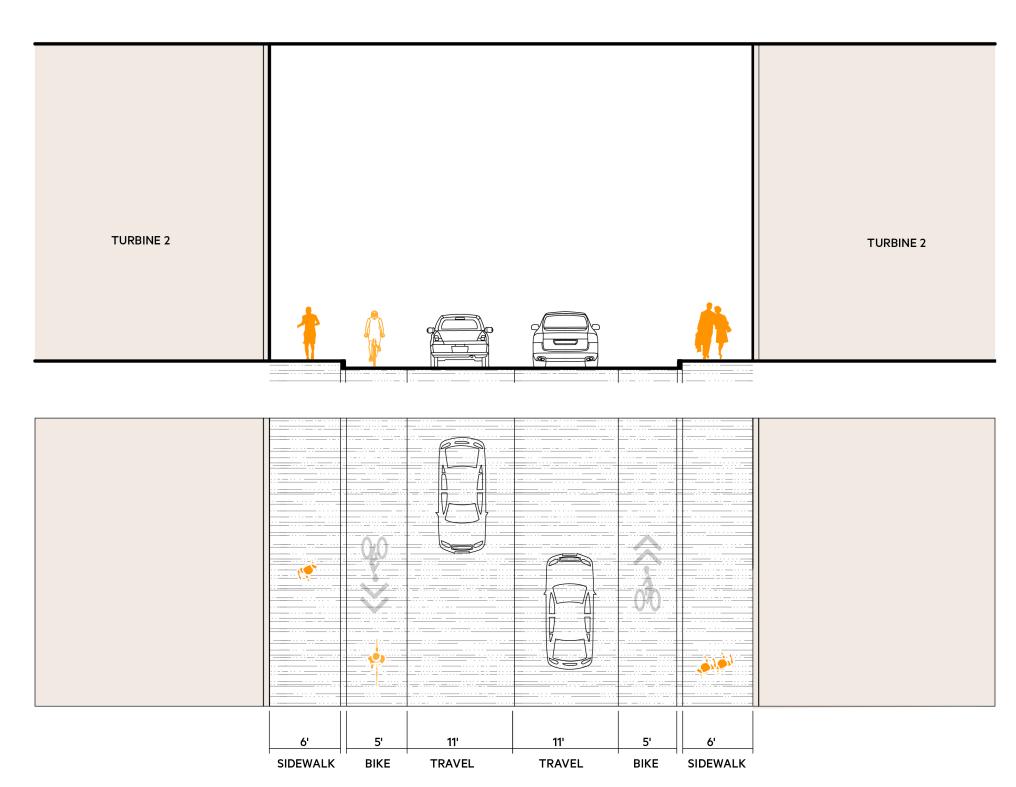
Street Section - Turbine Hall at Elkins Street
